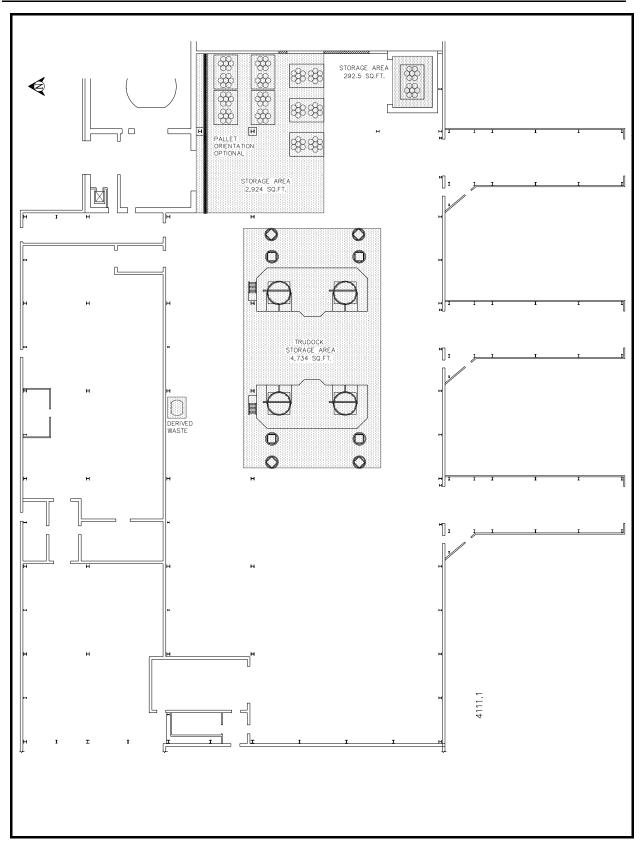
, Waste Handling Building Temporary Storage Areas for CH Waste Containers
